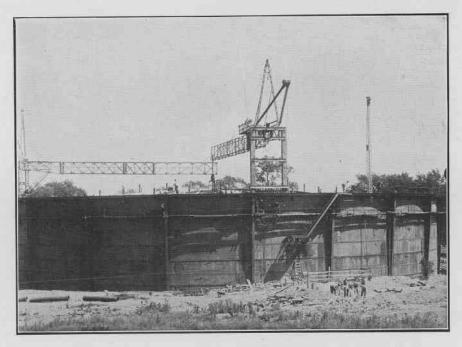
View of Tank, Taken August 1, Showing Big Derricks.
